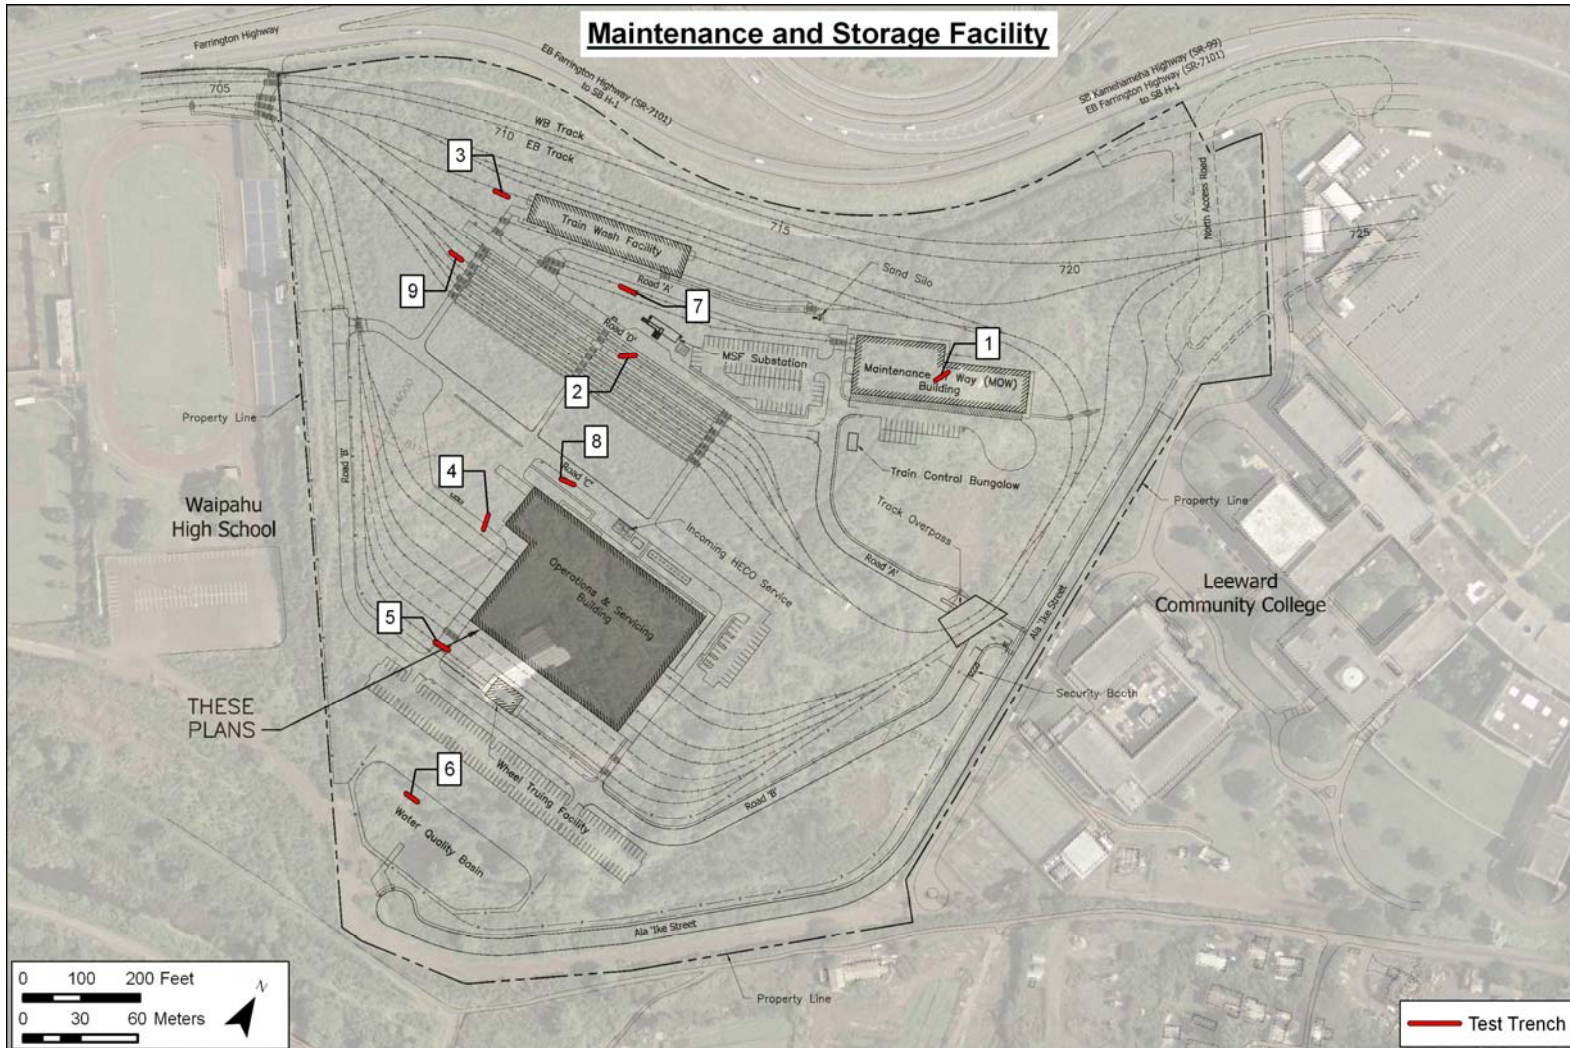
Maintenance and Storage Facility floor plan showing the location of test trenches
